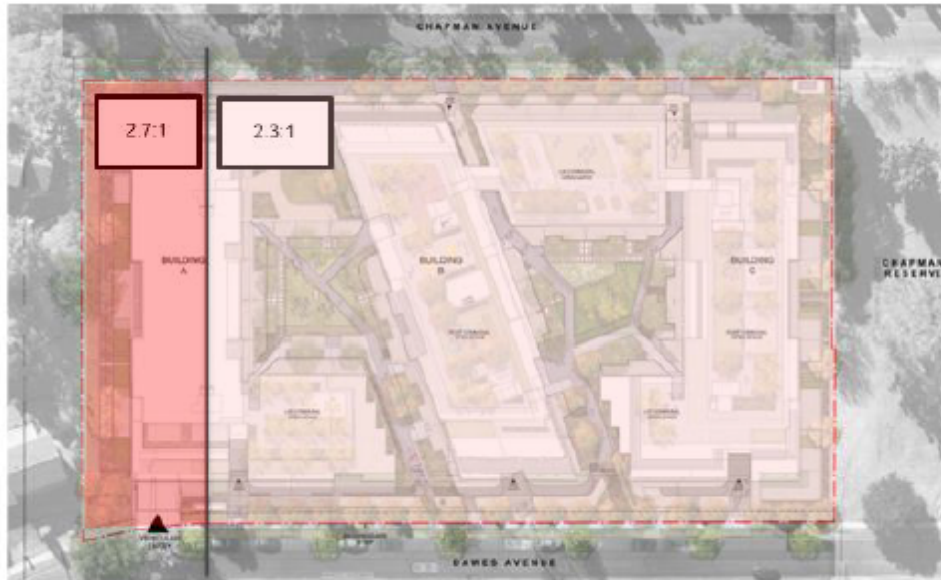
Site Plan showing location of Building A, B and C and split in FSR control
